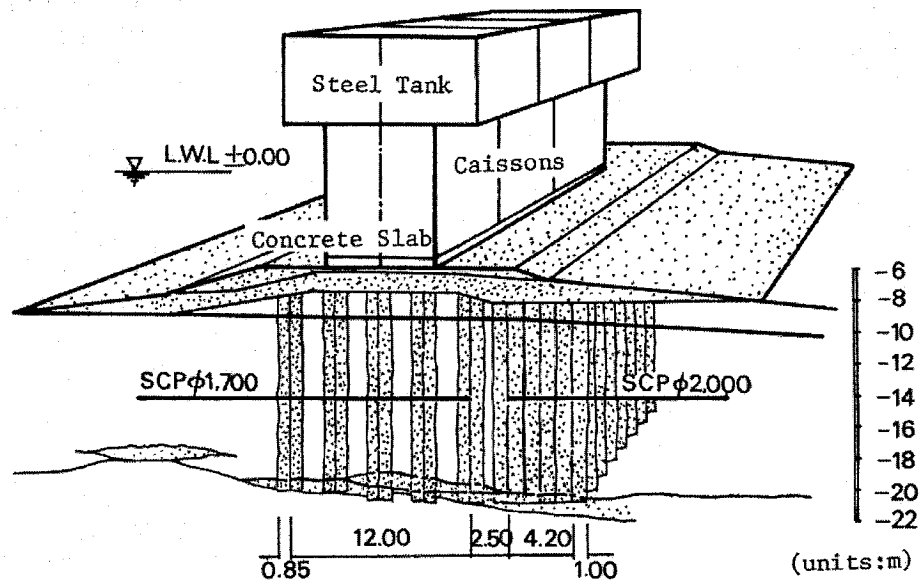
Set-up of full-scale load test of a group of stone columns, after Terashi et al. (1991).
